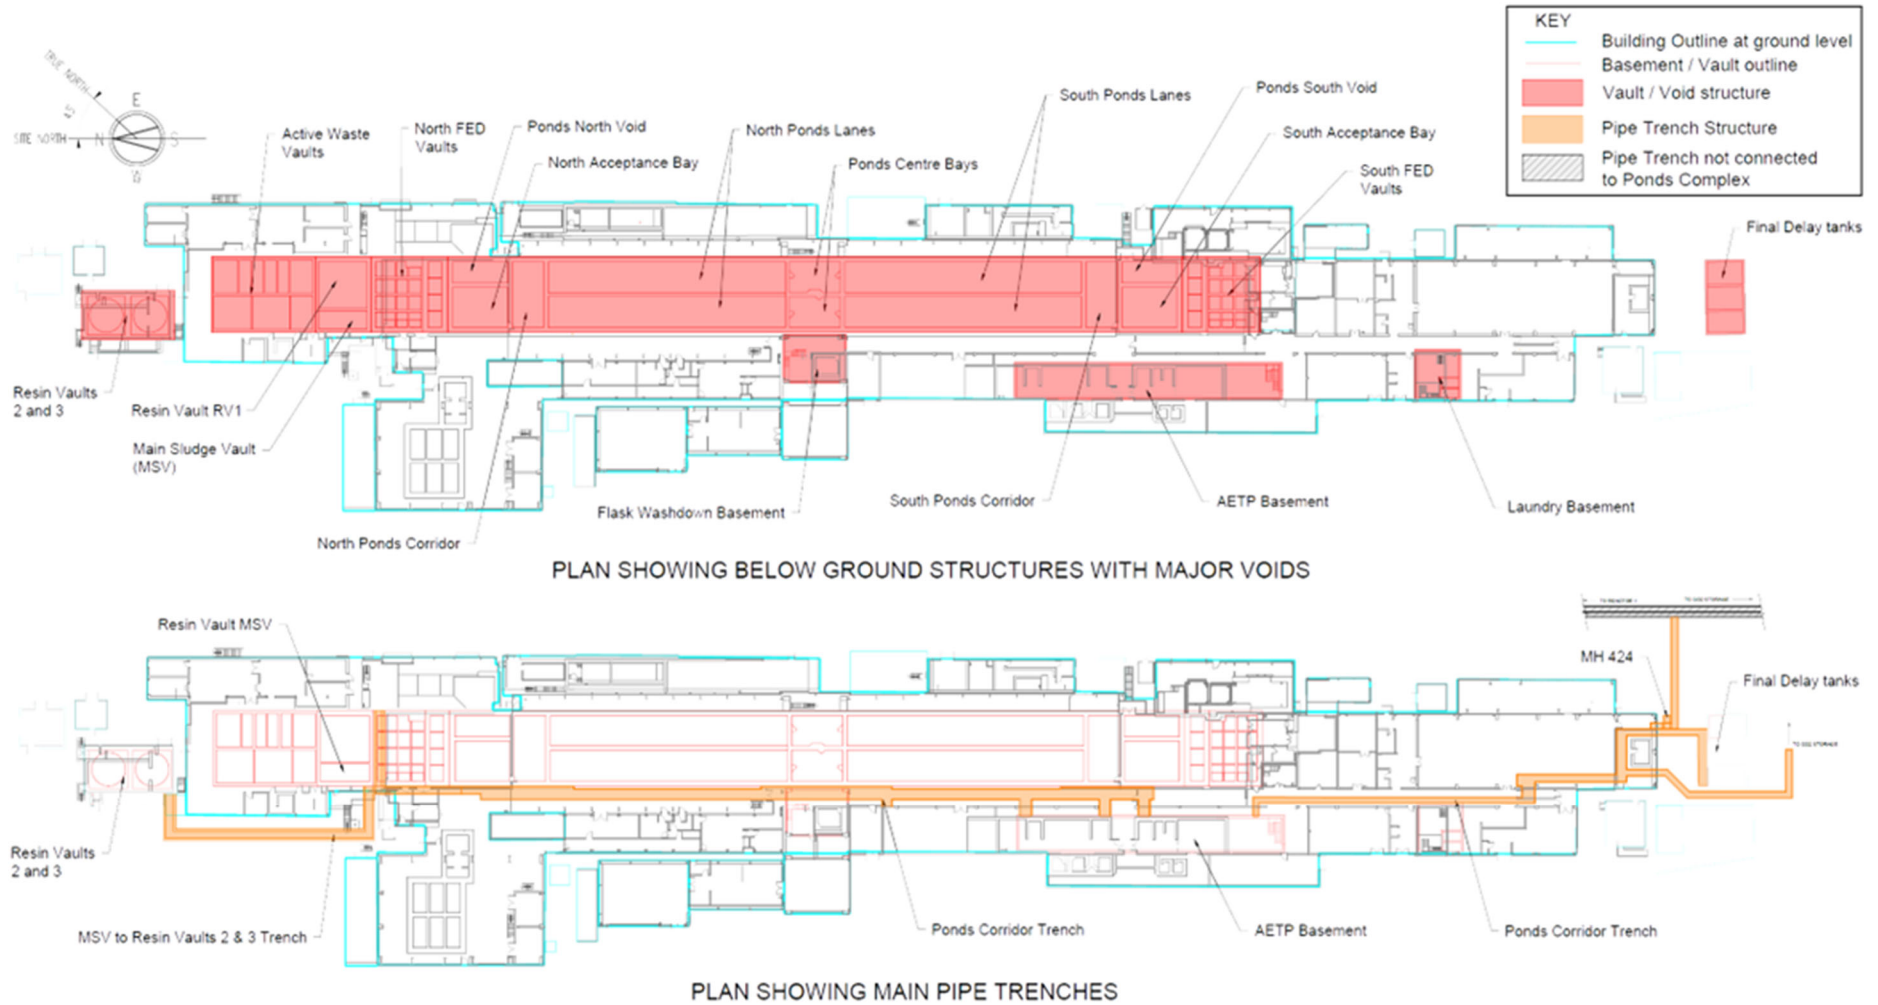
Plans of the location of the proposed on-site disposals within the Ponds Complex, showing the locations of the sub-surface voids and pipe trenches. [SWESC Figure 1-7.]
